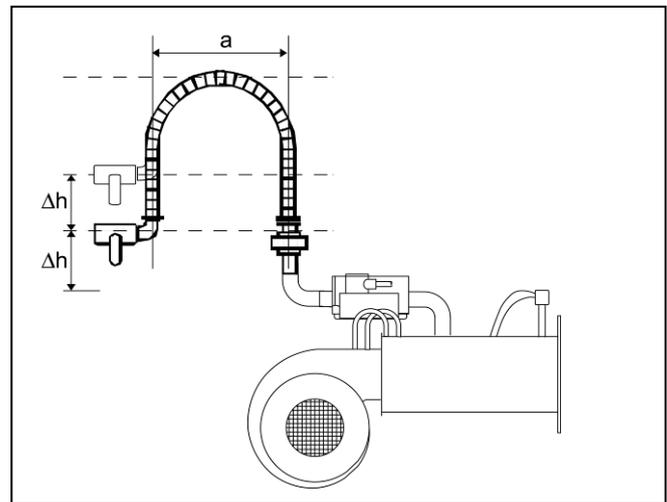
Alternative flexible hose 180° -bend with 2 x 90° elbow
